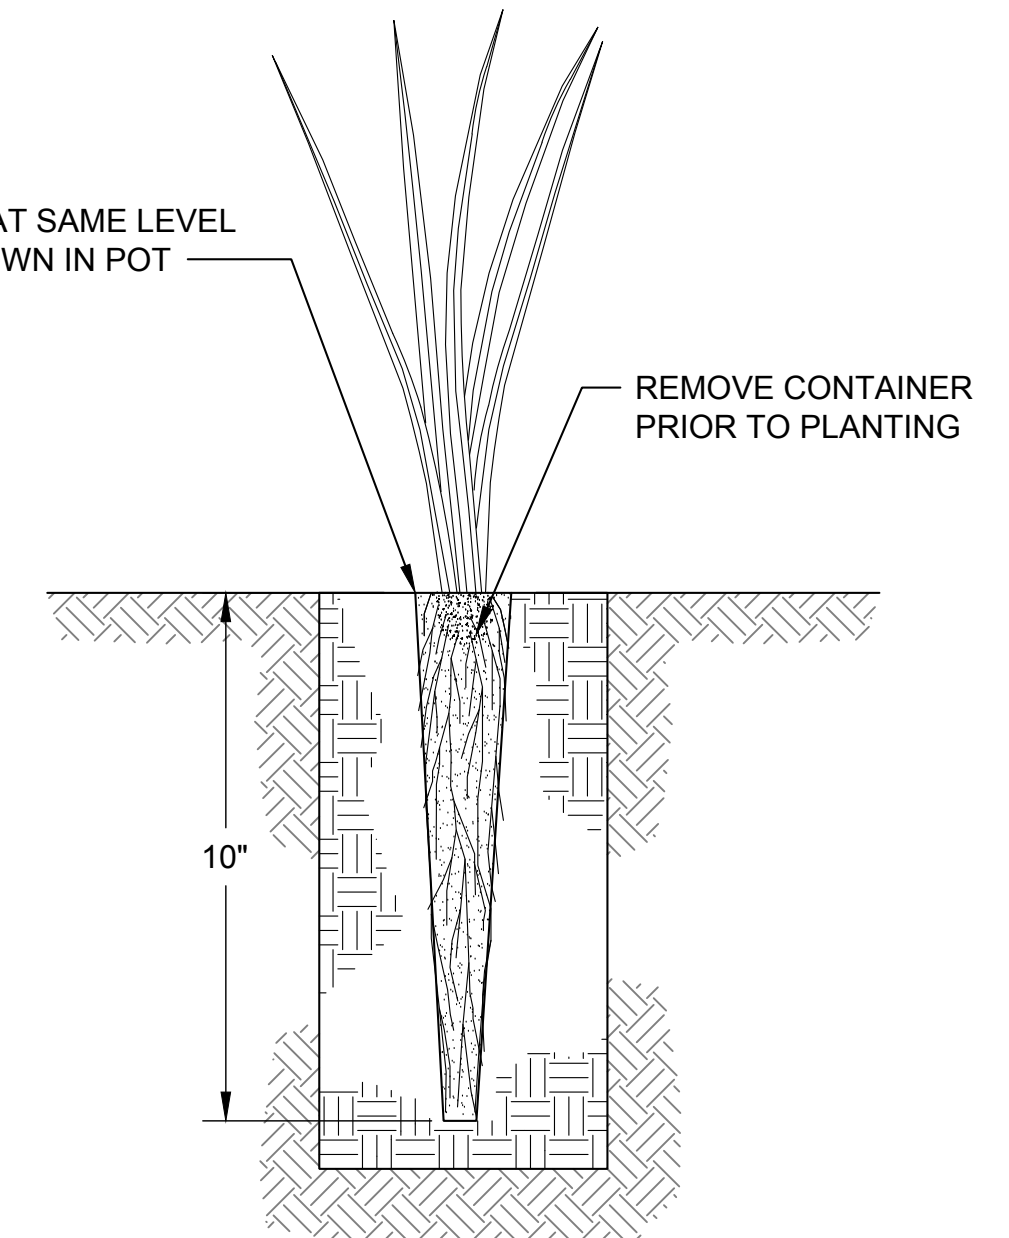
DETAIL - CONTAINER OR ROOT CONTROL BAG PLANTING
